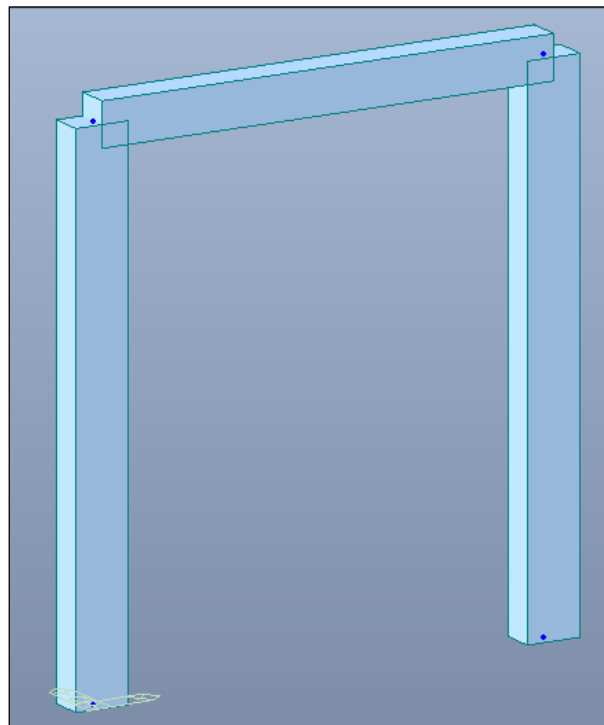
Reinforced Concrete Frame model in MIDAS GEN
